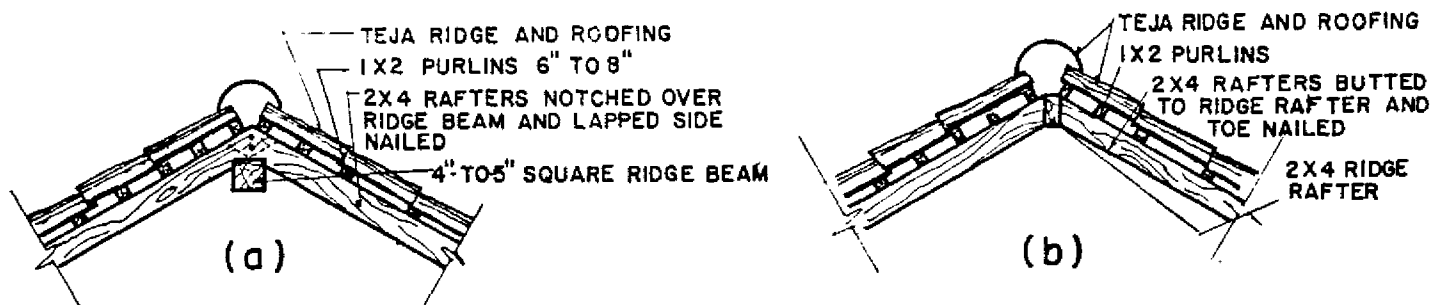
(a,b) ROOF DETAILS FOUND IN EARTHEN HOUSES
